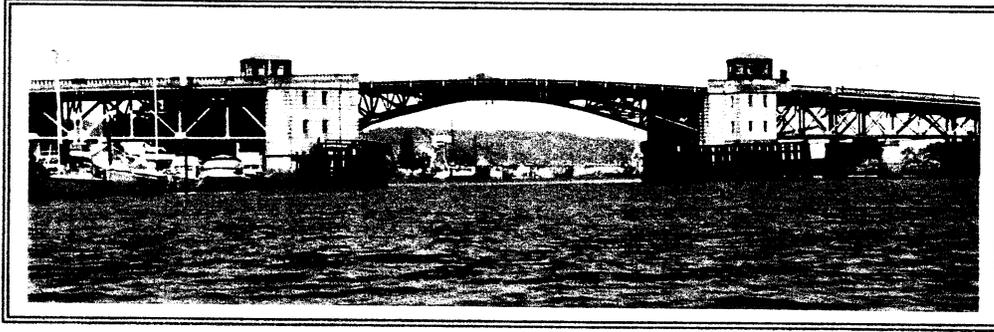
16th Avenue Bridge - Viewed from the east.
